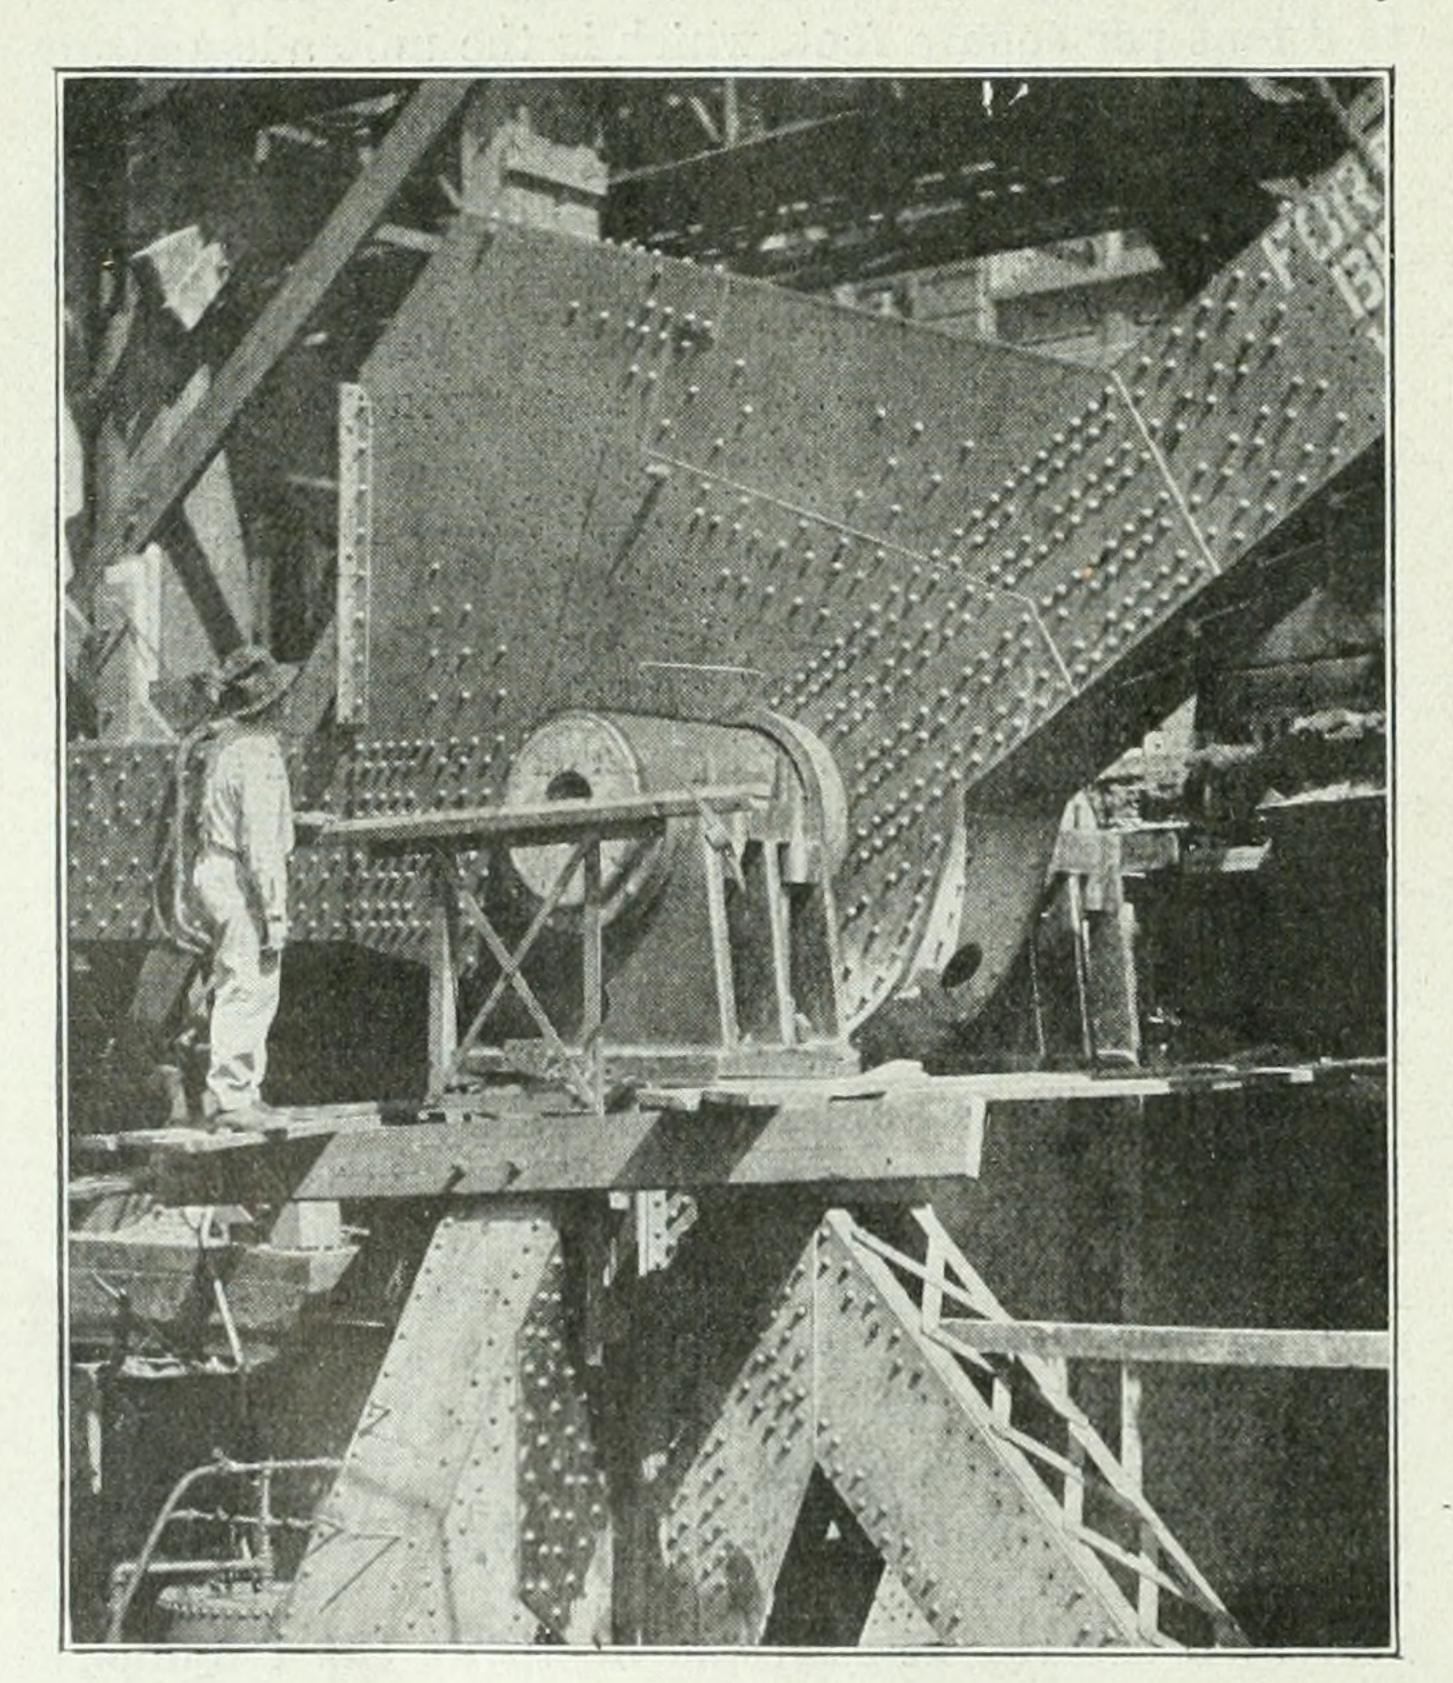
TRUNNION AND MASSIVE TRUSS MEMBERS
